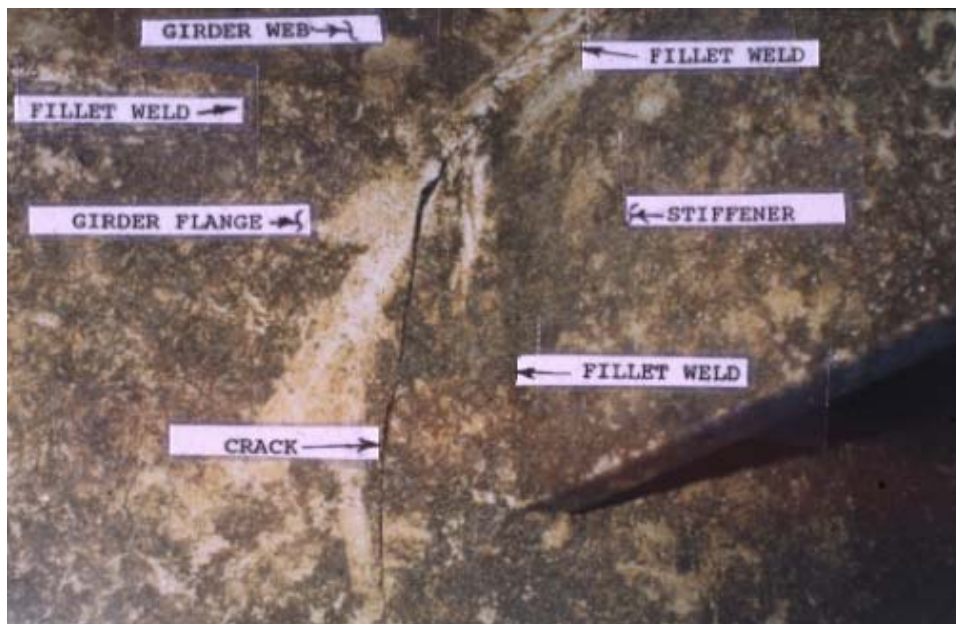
Intersecting welds at web stiffener of the girder shown in Figure 8-13
